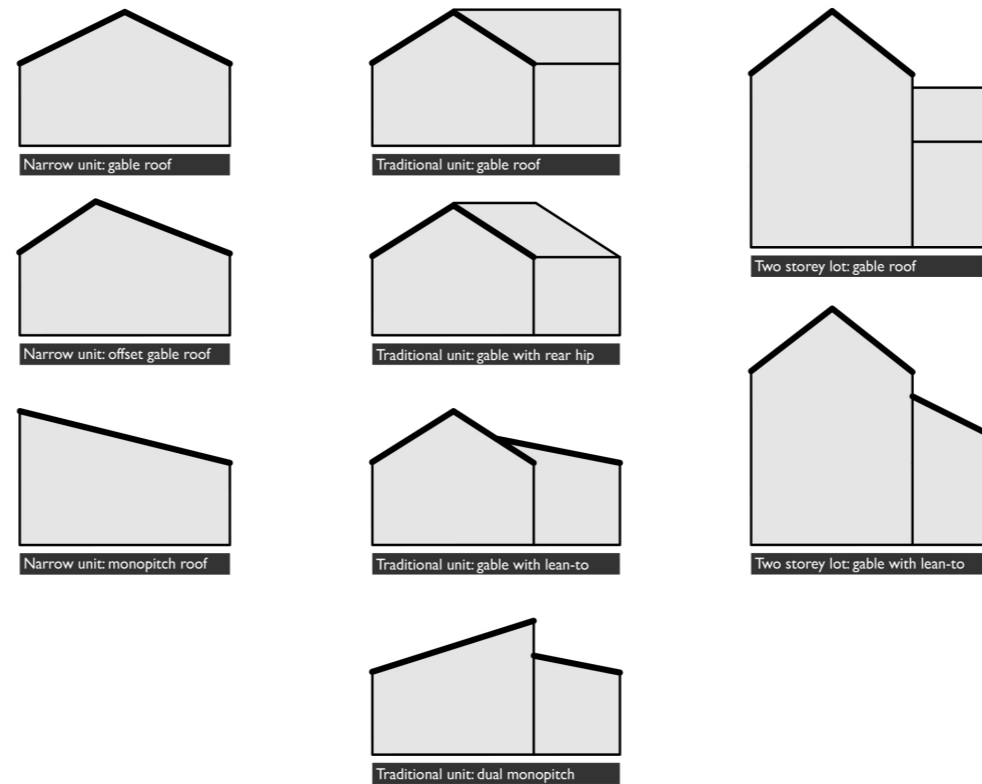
Roof forms proposed for the Patterson Block Masterplan
